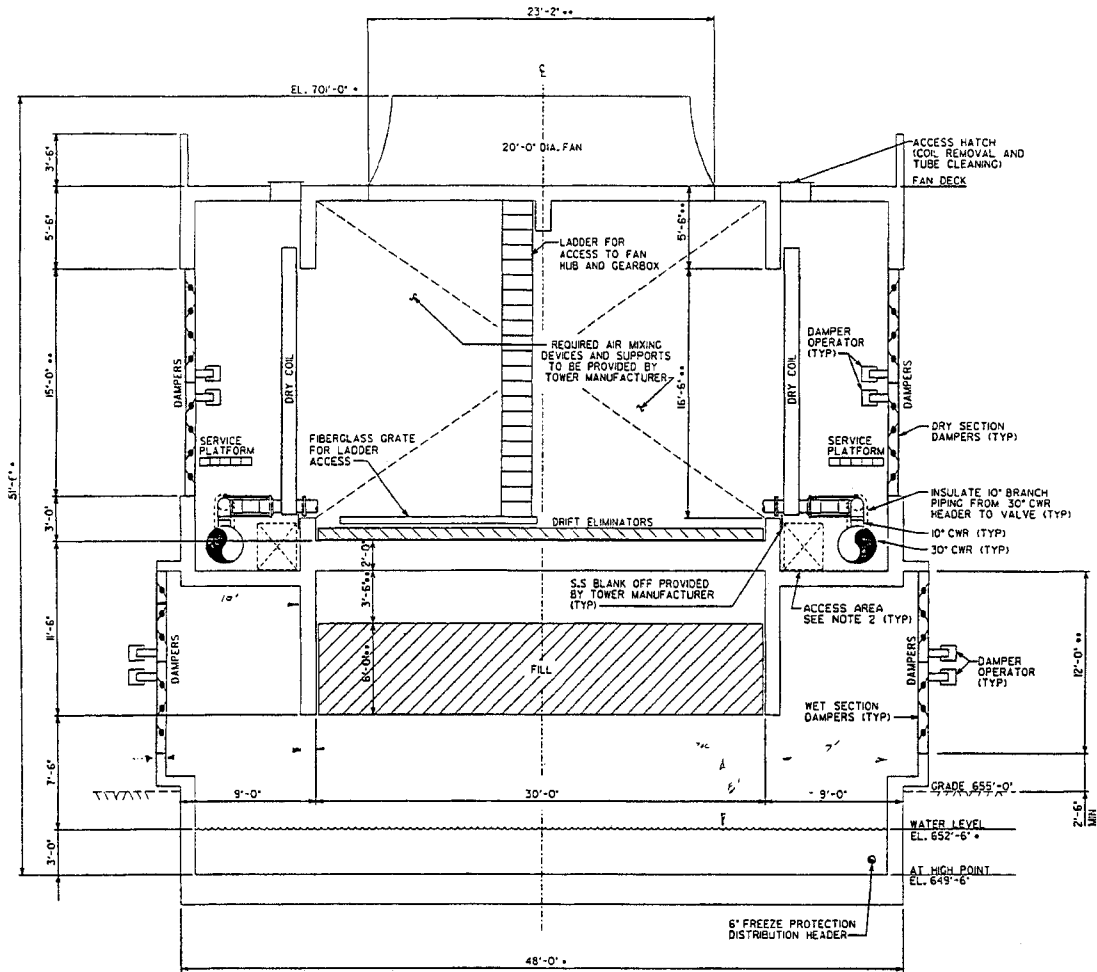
Transverse Cross Section of Cooling Tower Design
